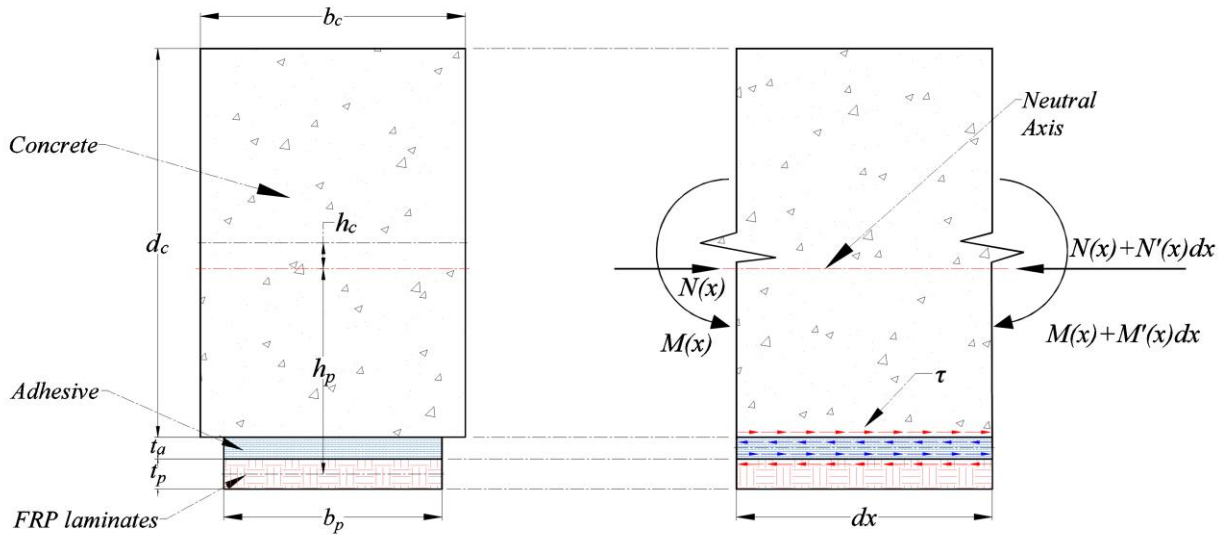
Cross-section and differential length section of concrete member strengthened by externally bonded FRP laminates under internal forces
